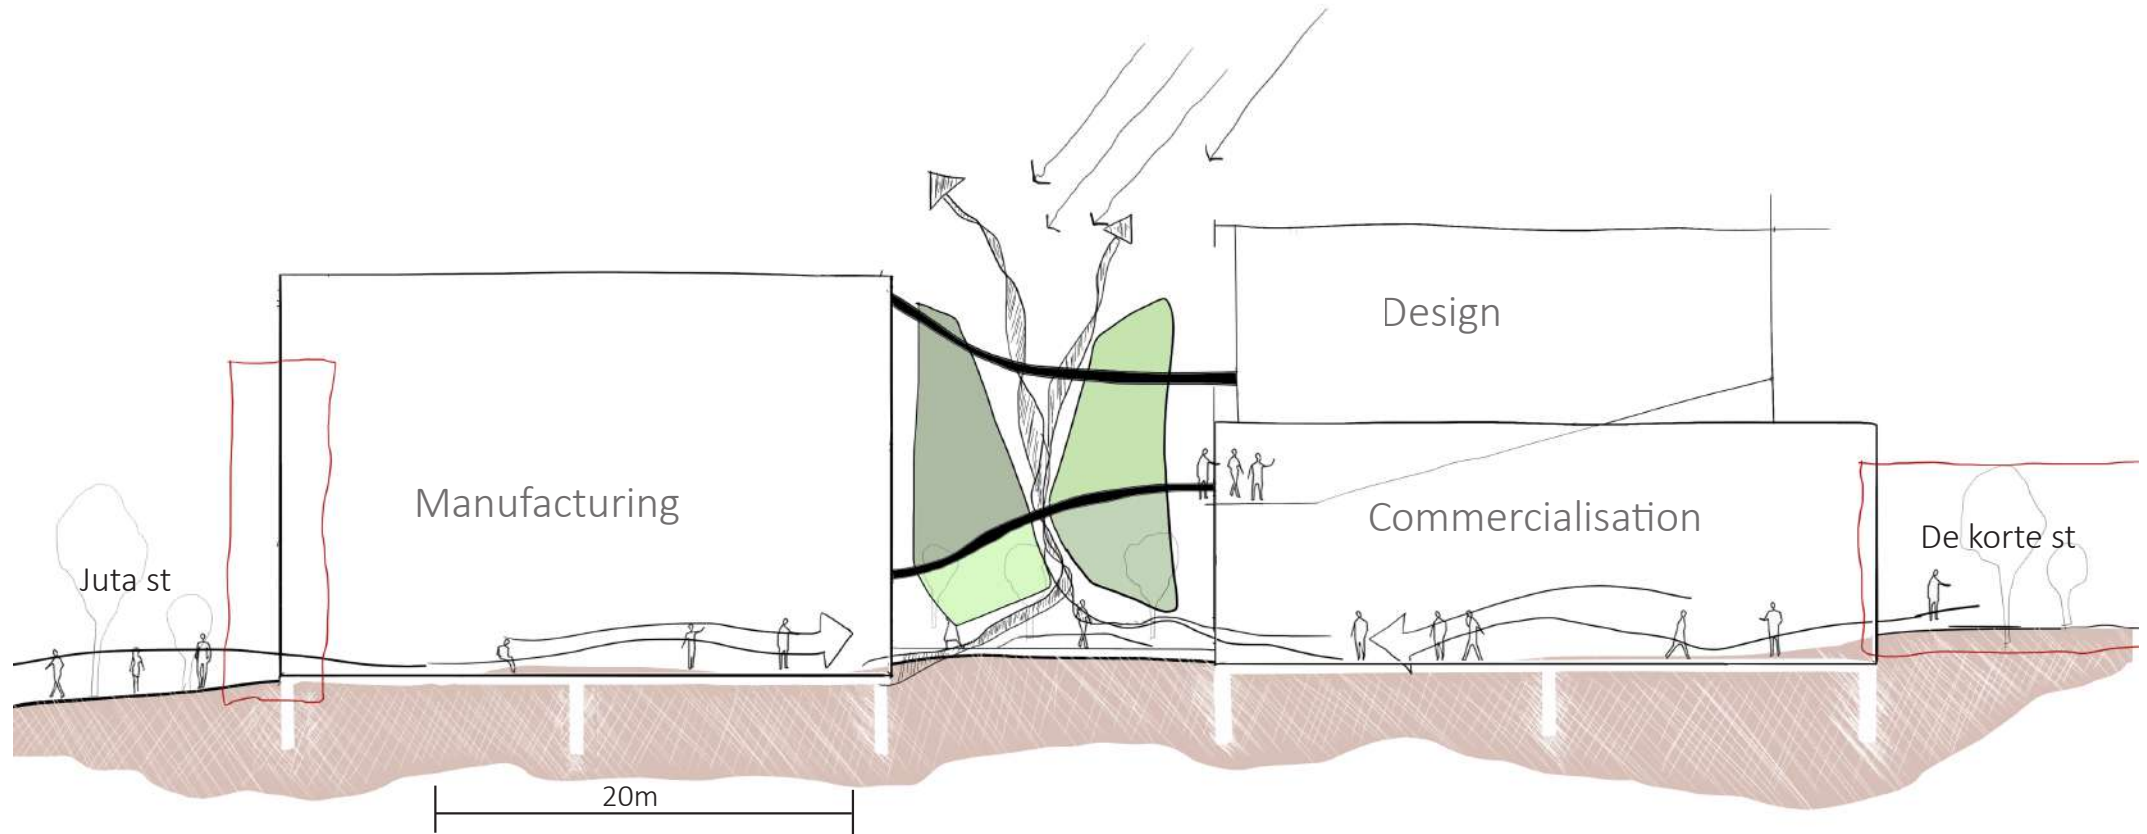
(viii): Schematic Sketch Ground Floor , (Author 2020).
